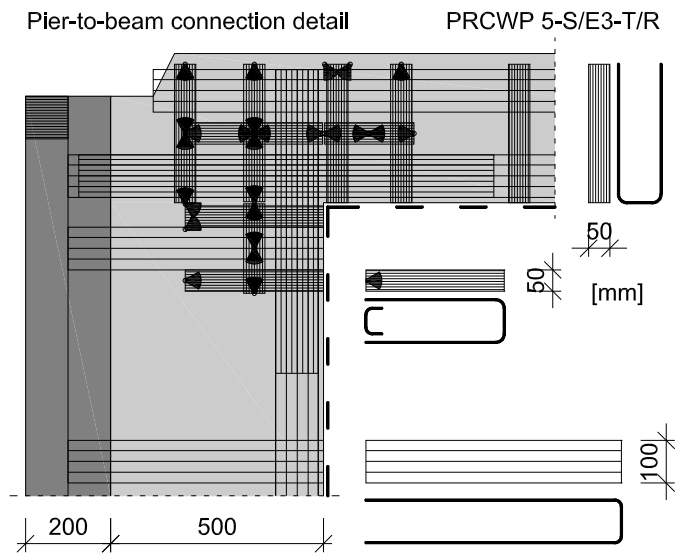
FRP layout detail at the pier-to-beam connection of PRCWP 5-S/E3-T/R
